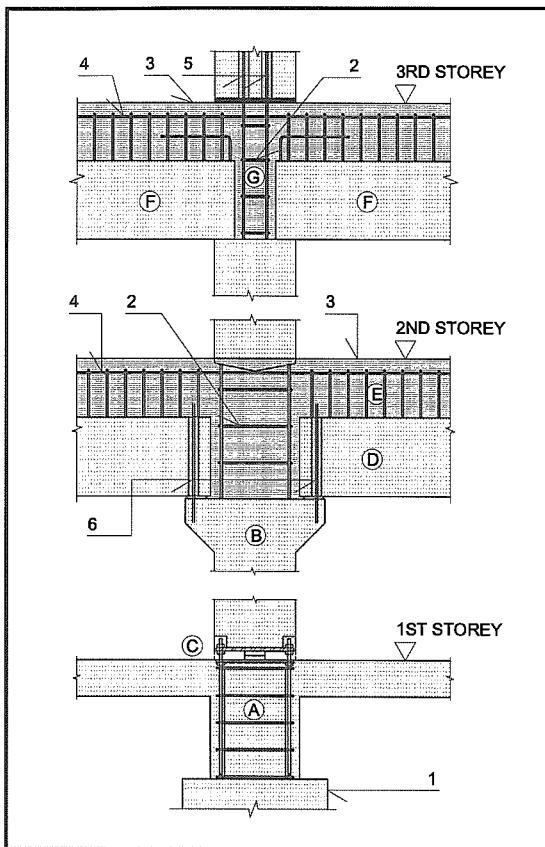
Illustration Example For Column/Stump, Column/Column And Column/Beam Connection
